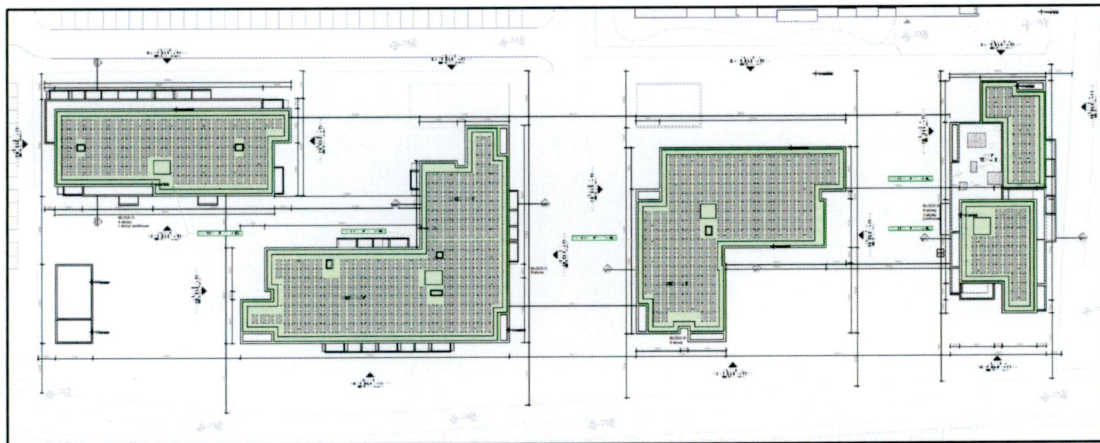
Extract from Drawing No. PA-107-ABCD (Proposed Roof Plan A, B, C & D) showing the provision of solar panels at all roof levels (source: Darmody Architecture cropped and annotated by TPA, 2022.)
